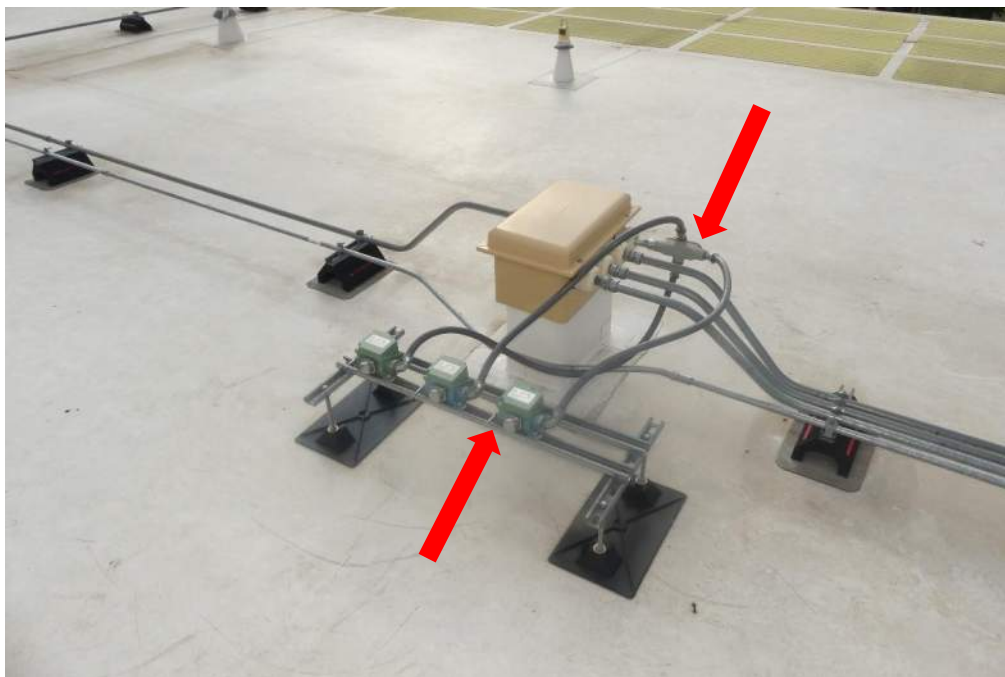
The heat trace cables extended up onto the upper low-slope roof, ran through junction boxes and conduit to where the roof penetrations and sensors were located.
